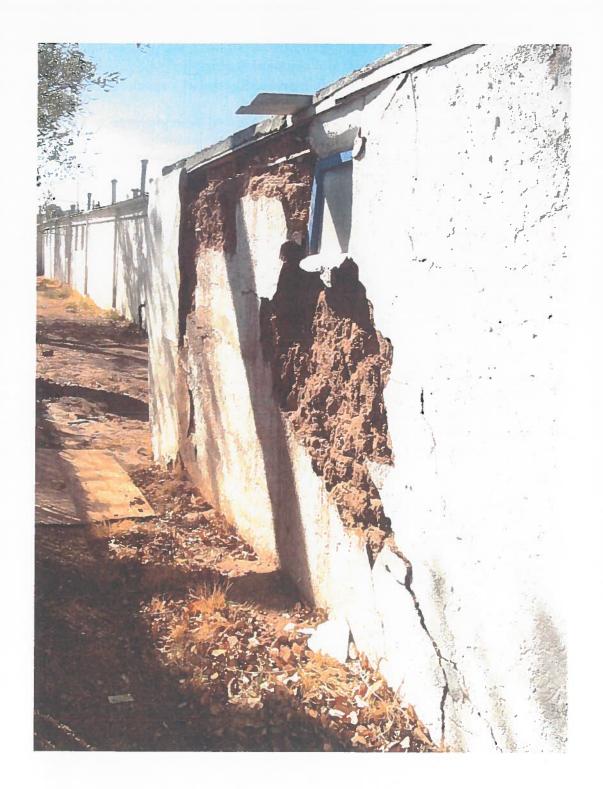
Wall Failure at Southeast Building Cluster
